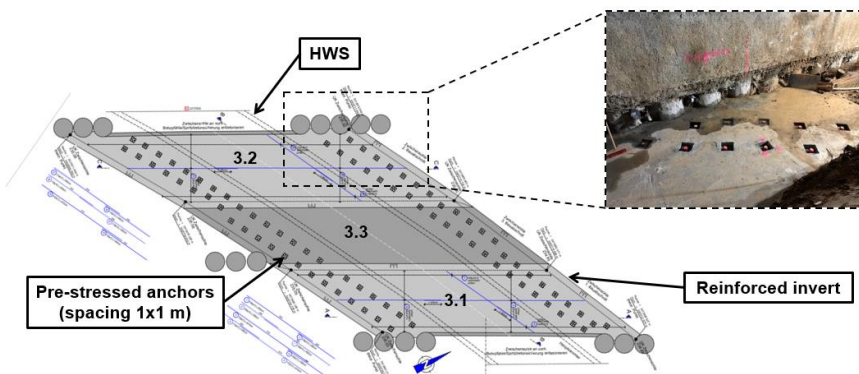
Plan view of reinforced invert and corresponding on-site photo
